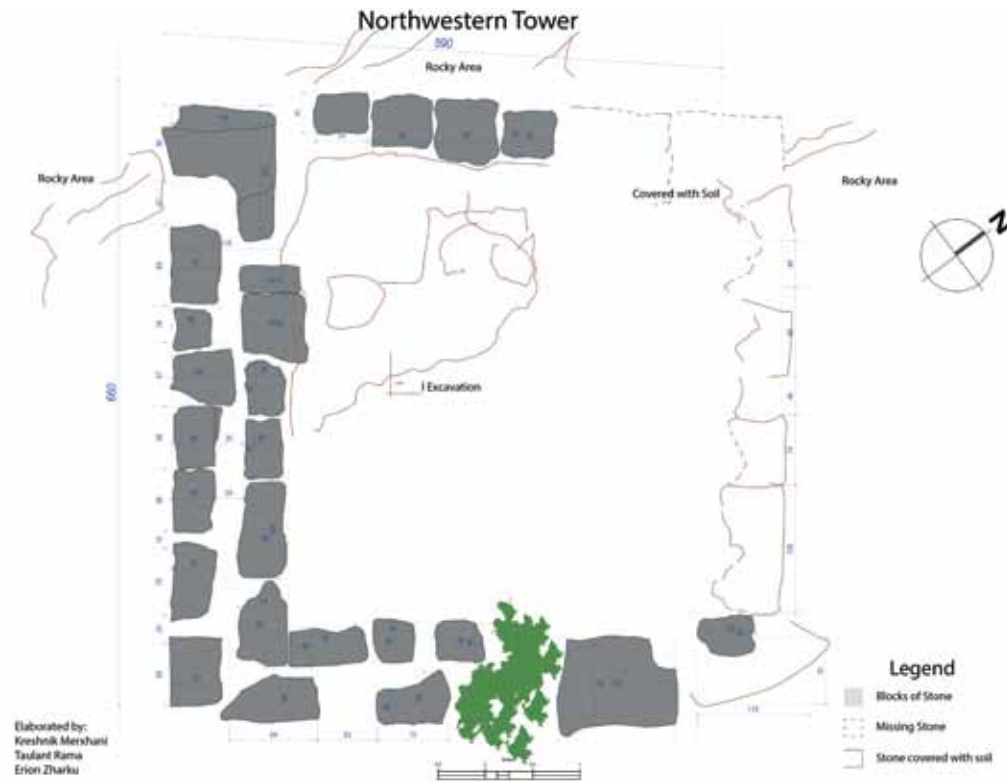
Floor plan of the northwest tower (made by: K. Merxhani, T. Rama, E. Zharku)
